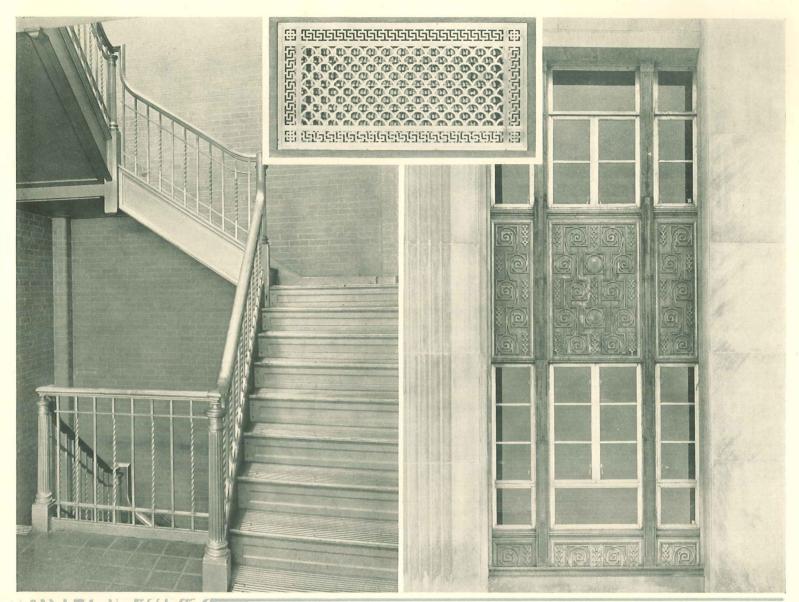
DETAILS OF HAND-HAMMERED ALUMINUM ELEVATOR
